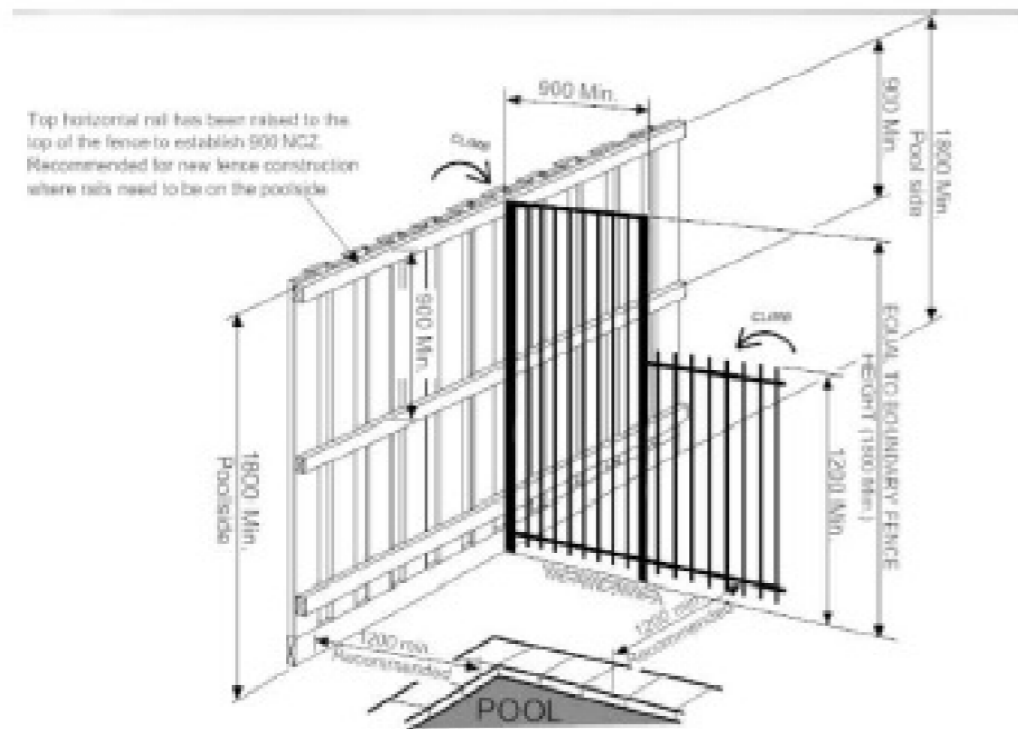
ALTERNATIVE BOUNDARY FENCE INTERSECTING A TYPICAL POOL BARRIER
